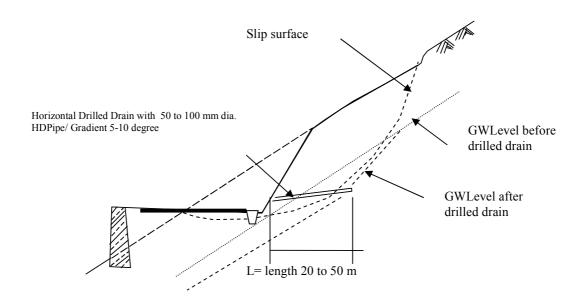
Typical Plan and Section of Horizontal Drilled Drain
